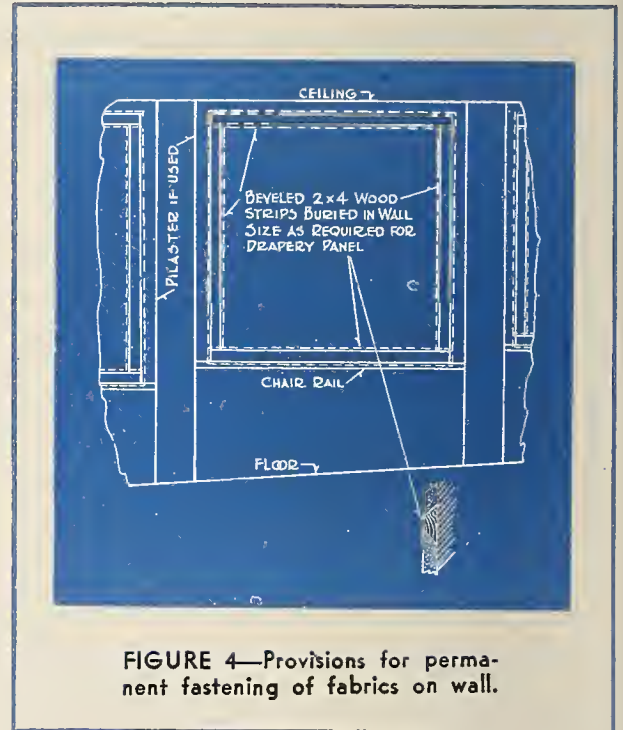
Provisions for permanent fastening of fabrics on wall.
